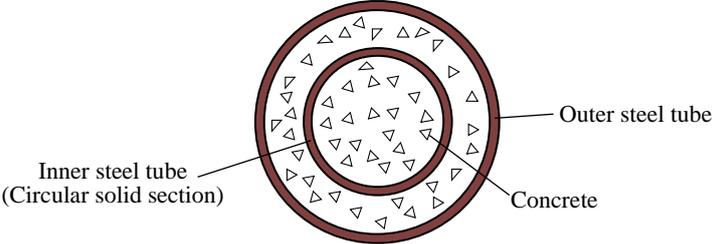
Cross-Section of concrete-filled double-layer steel tubular column (CFDLT column)
